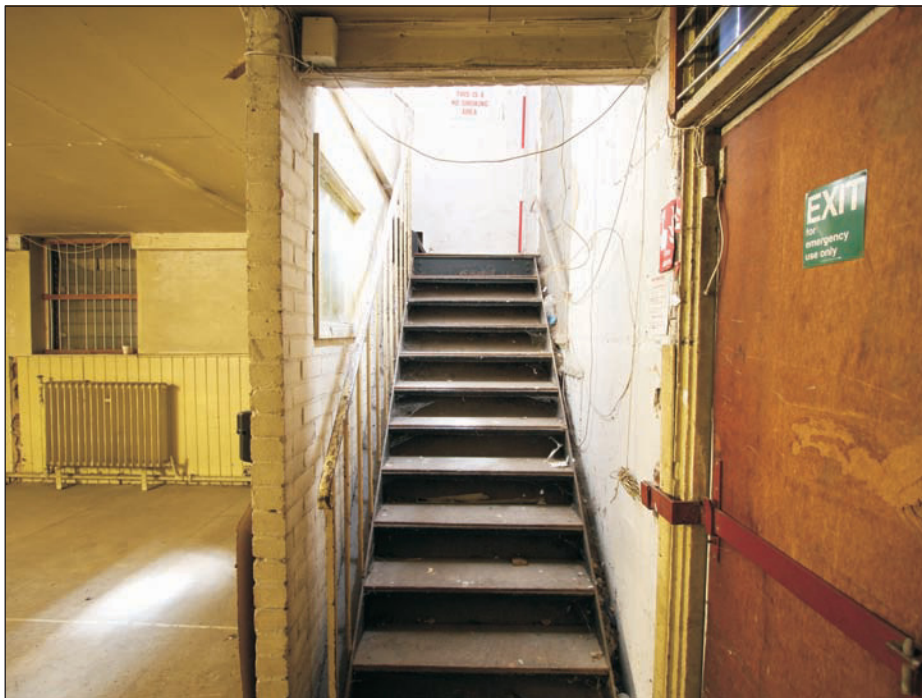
Detail of interior stairs to first floor of Hall. Looking north
